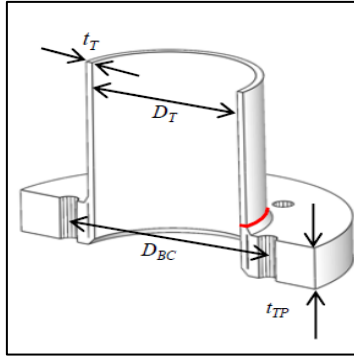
Tube-to-transverse-plate connection, location of anticipated fatigue crack at the weld toe on the tube is shown in red (AASHTO, 2013)
